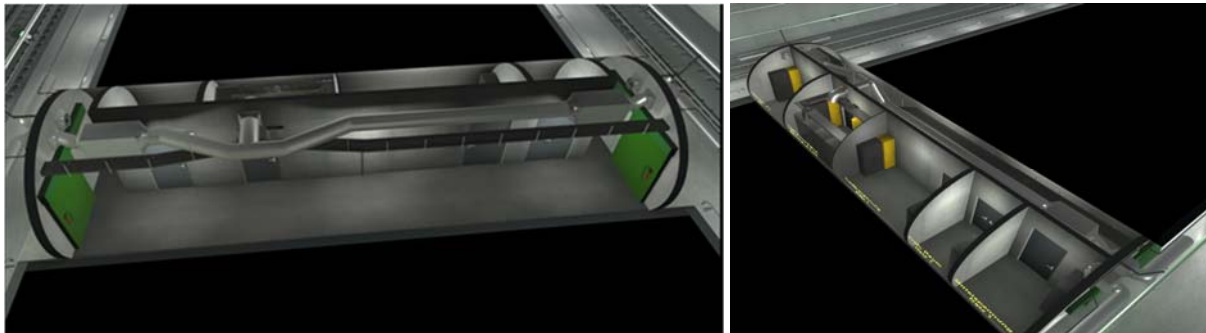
Principle layout of cross-passages in a modern twin-tube single track tunnel [14]
